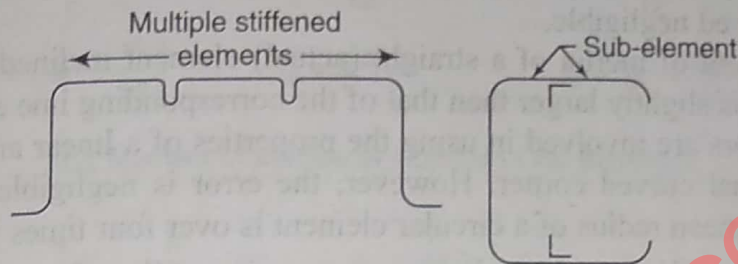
Multiple Stiffened Element and Sub-Element
